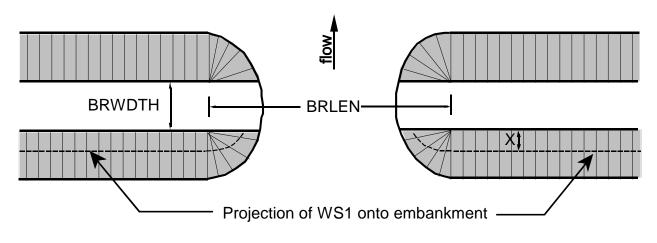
Definition sketch: type 1 bridge opening (BRTYPE = 1).
